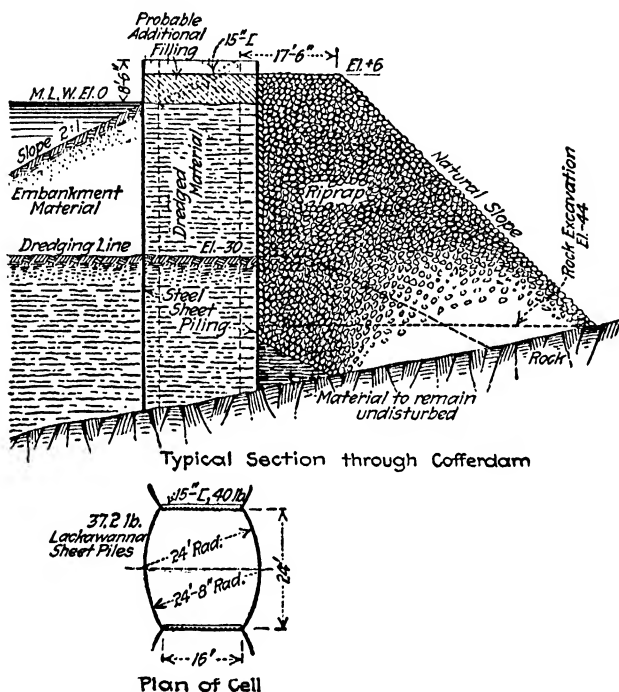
Cellular Steel Sheet-pile Cofferdam.
